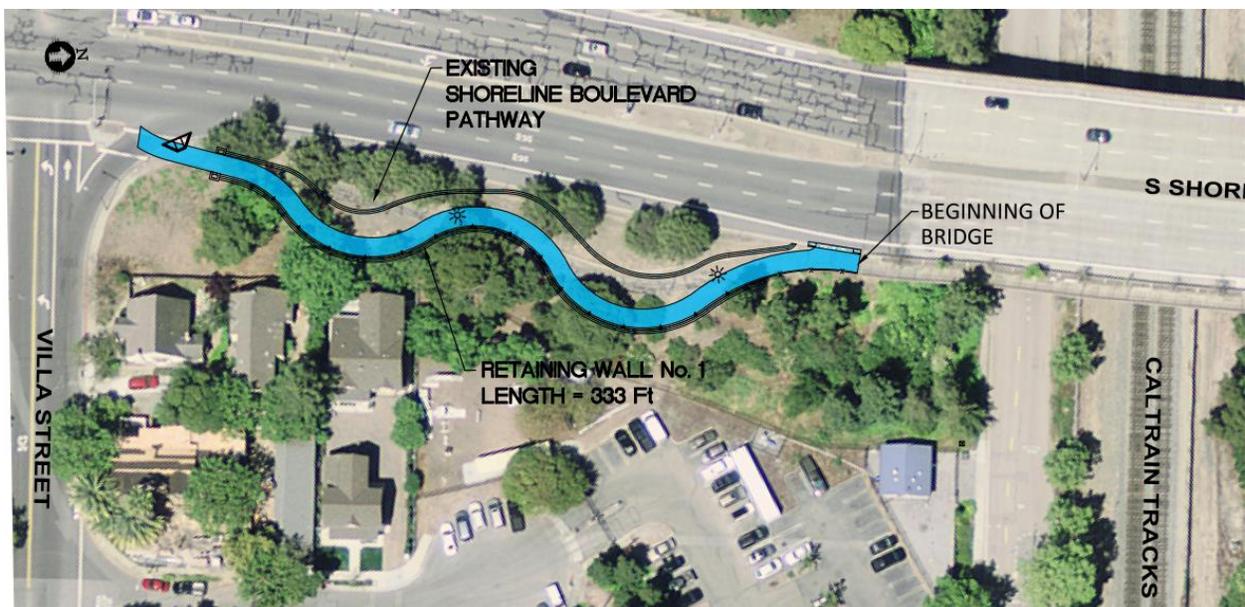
Villa Street to Shoreline Boulevard Overpass Structure
